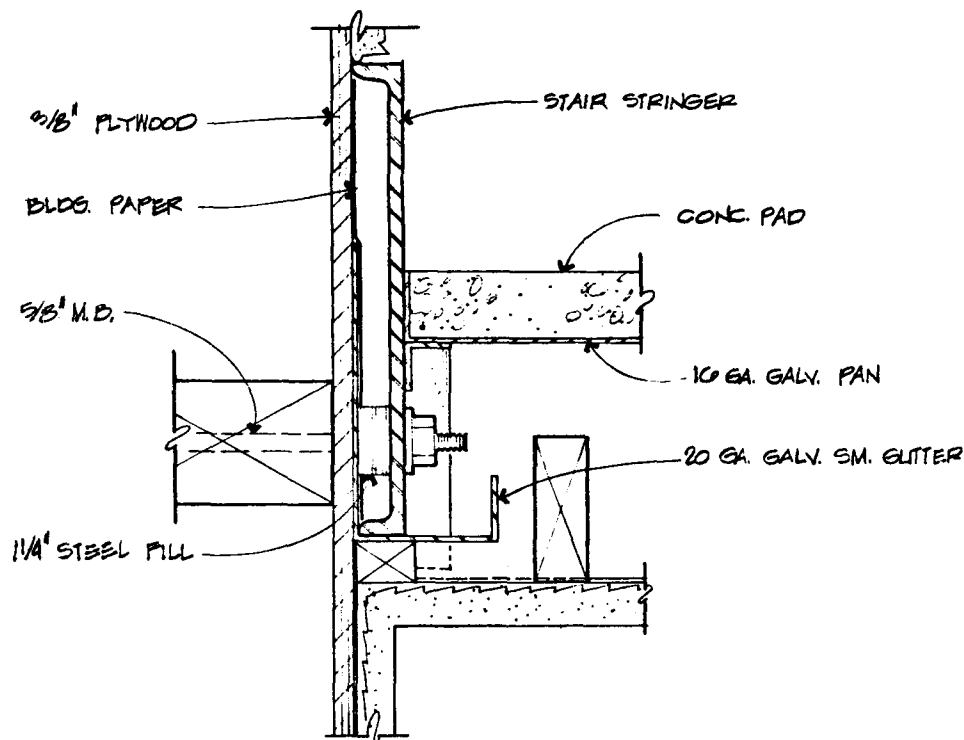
Stair stringer detail as designed showing sheetmetal gutter.
